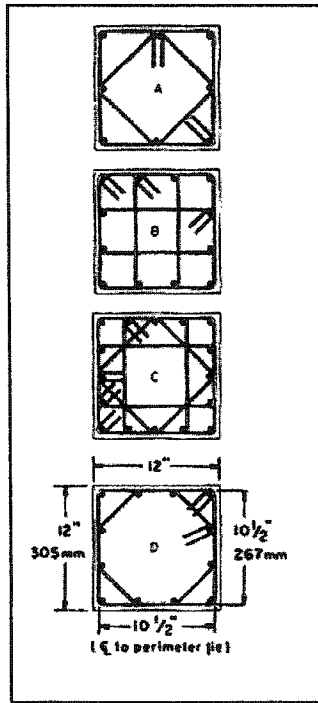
Columns details (after Sheikh and Uzumeri 1980)
